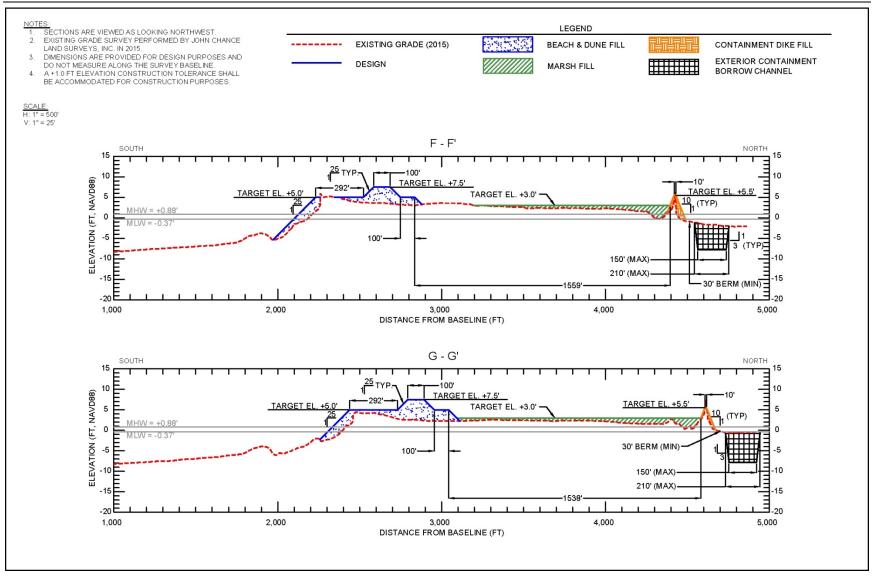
West Belle Headland Renourishment Typical Cross Sections
